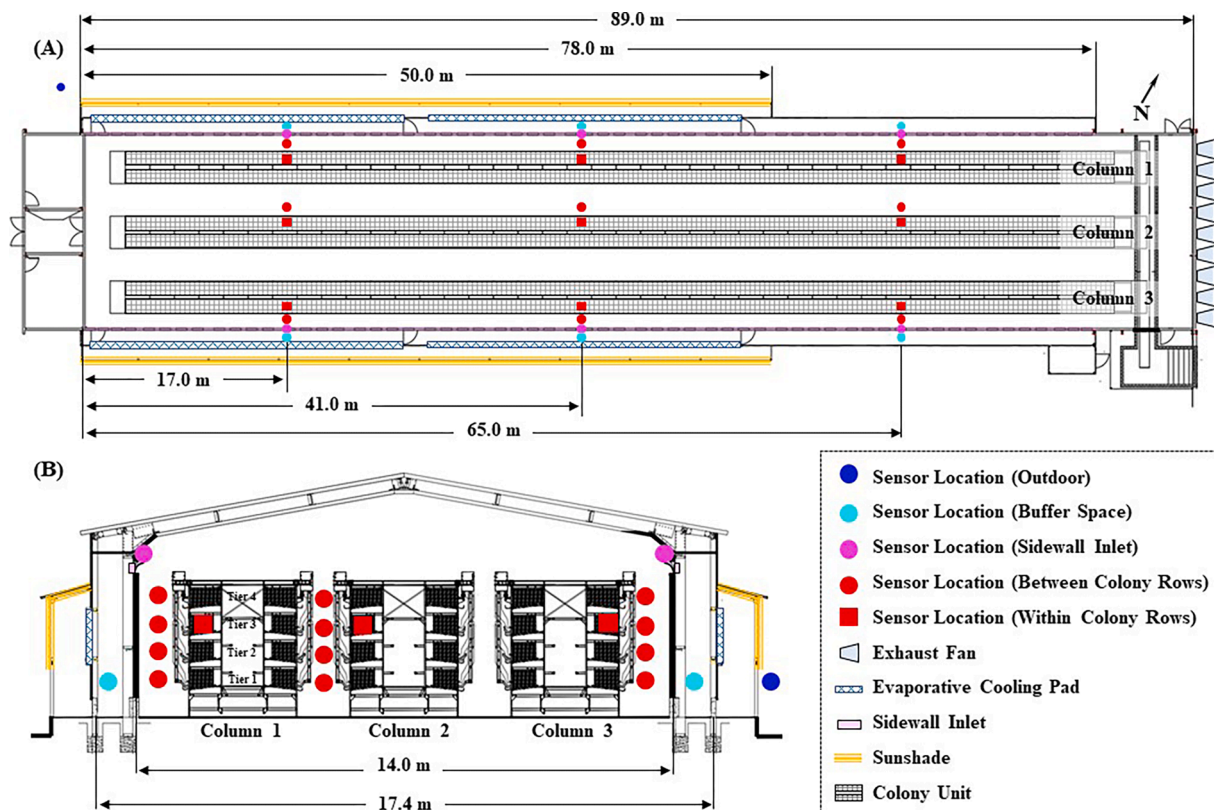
Schematic of the layer hen house showing the floor plan (A) and the cross-sectional view (B) of the house layout, ventilation system, and sensor locations for the temperature and relative humidity.
